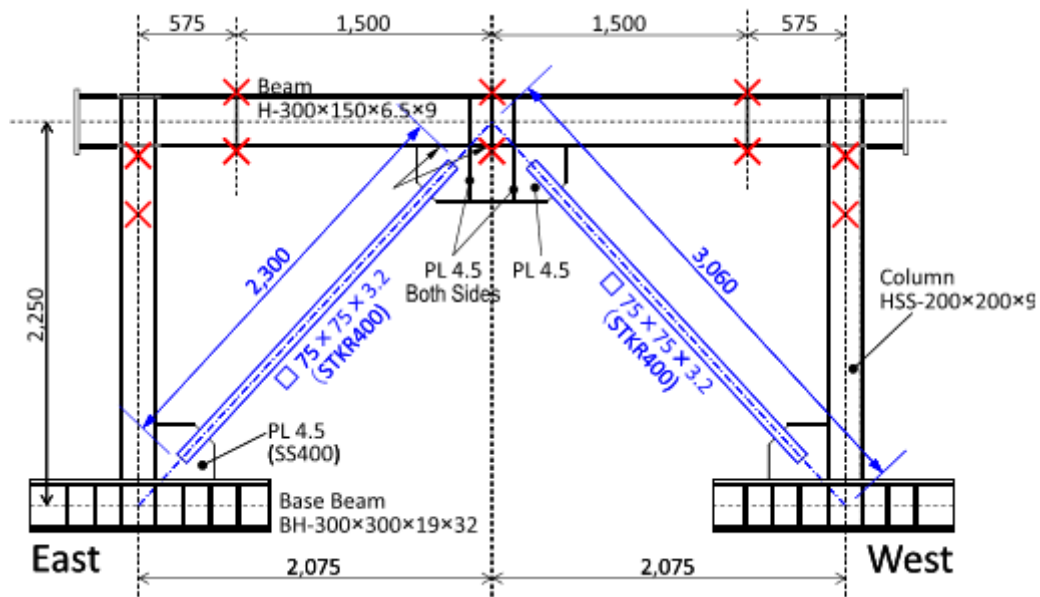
Test Specimen and out of plane bracing points (Okasaki et al. 2013)
